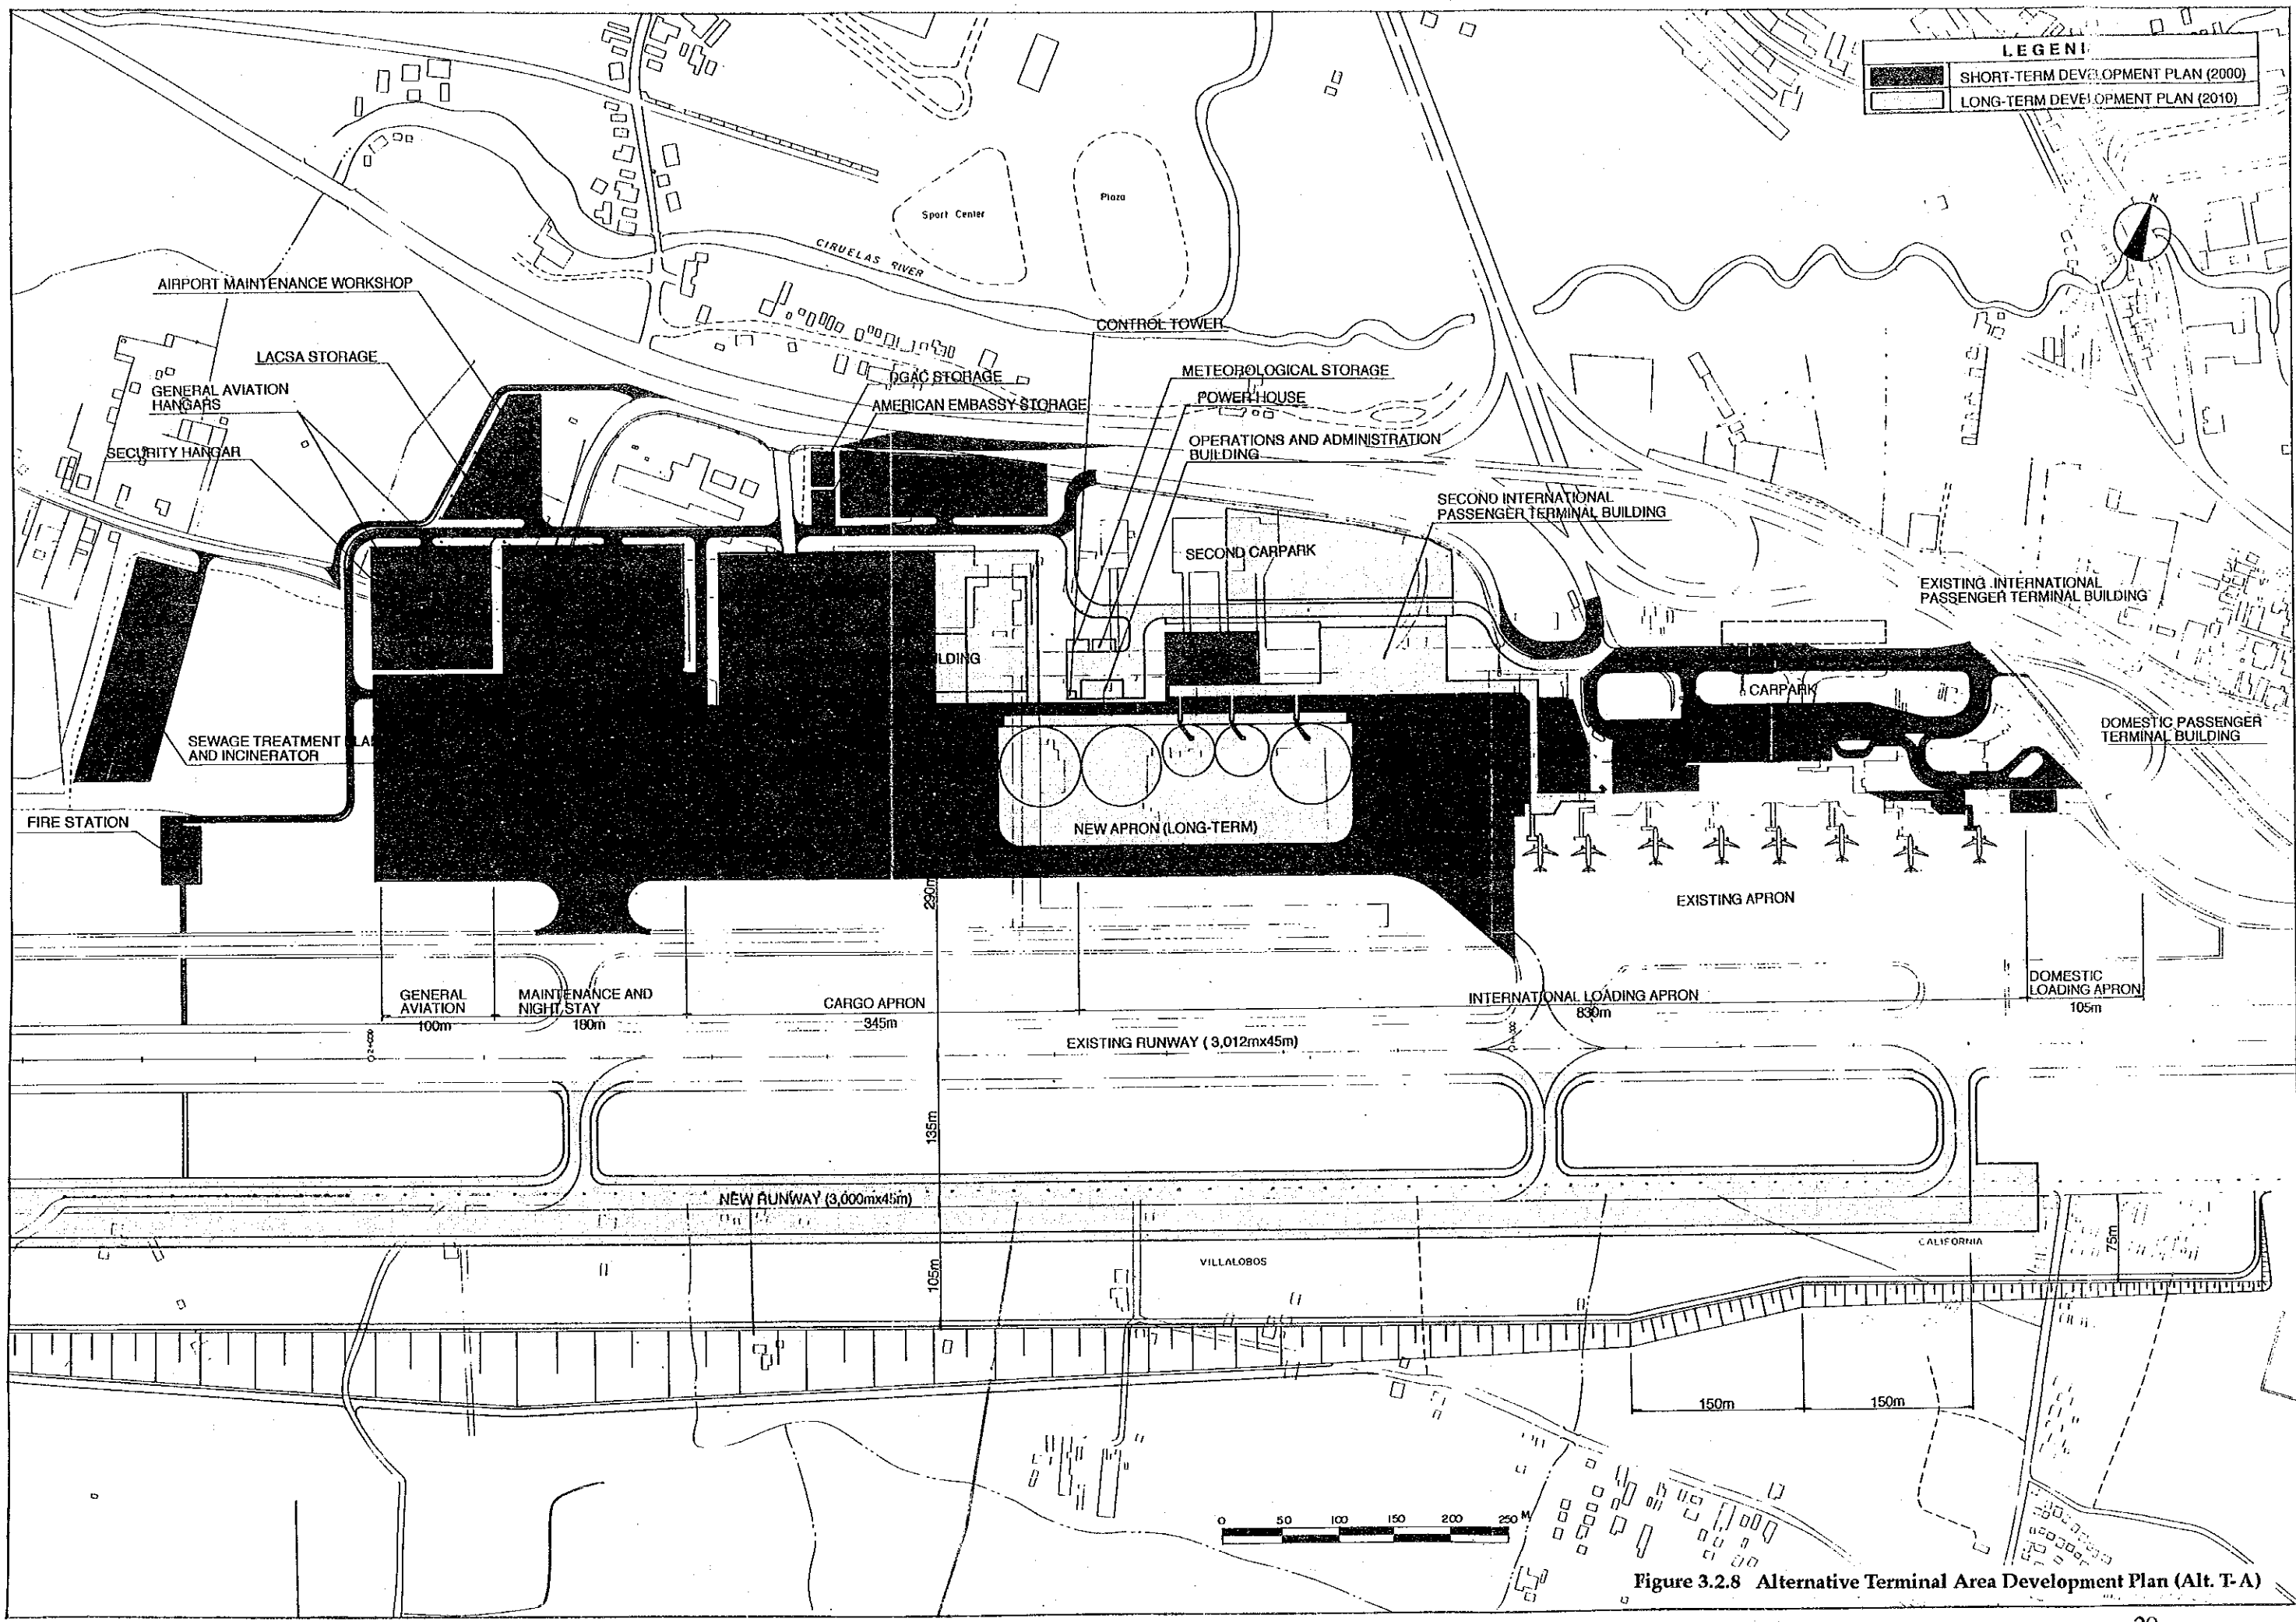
Alternative Terminal Area Development Plan (Alt. T-A)
